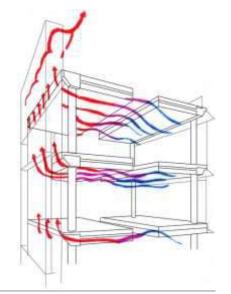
Section ofhow natural ventilation works through the gaps of the building flooring
